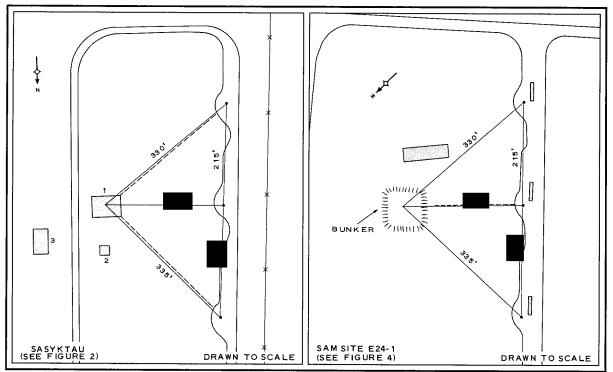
LAYOUT OF THE WESTERN LOOP ROAD OF THE SASYKTAU MISSILE-LAUNCH FACILITY AND PART OF THE MOSCOW SAM SITE E24-1.
